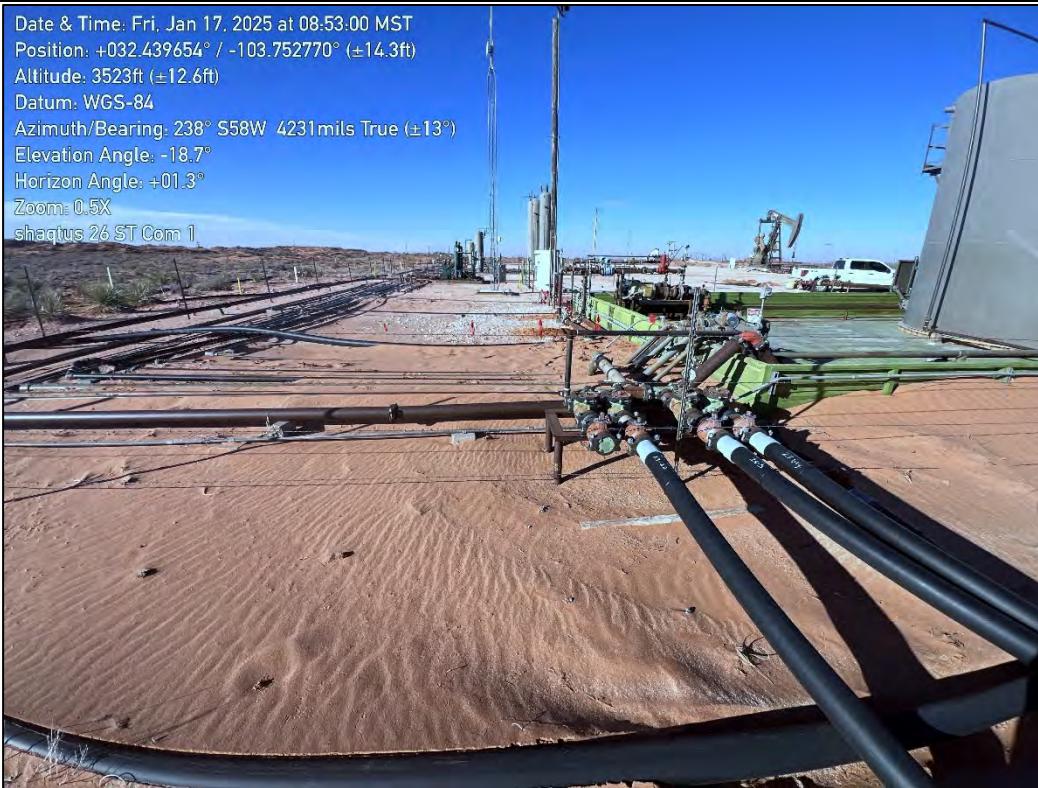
Southwestern view outside of containment during liner inspection activities. 1/17/2025
